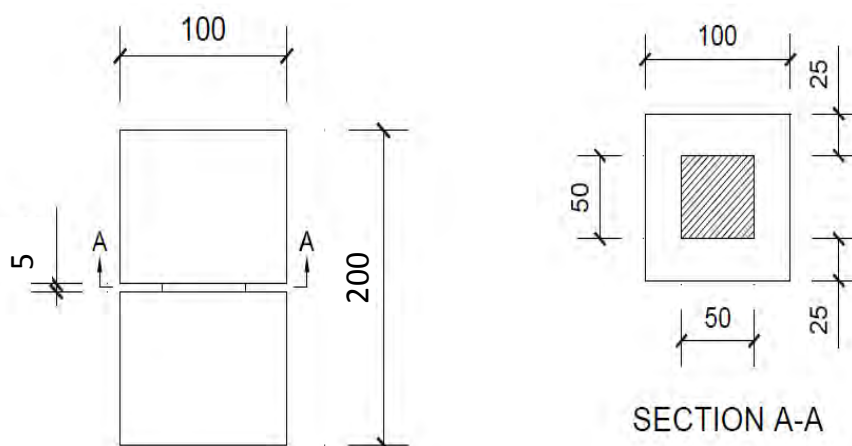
Notched test specimen for uniaxial tensile fatigue tests (dimensions are in mm)
